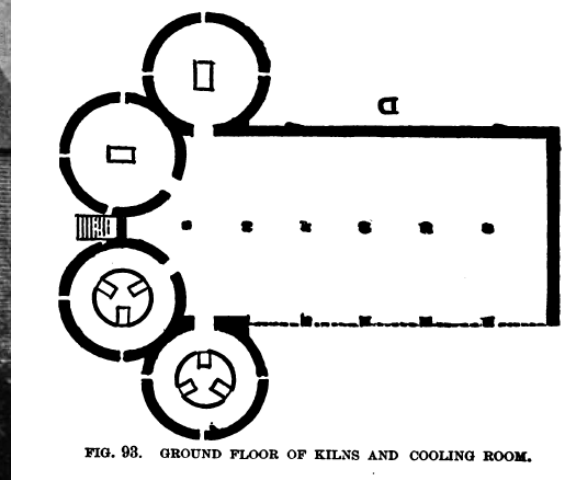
GROUND FLOOR OF KILNS AND COOLING ROOM.
